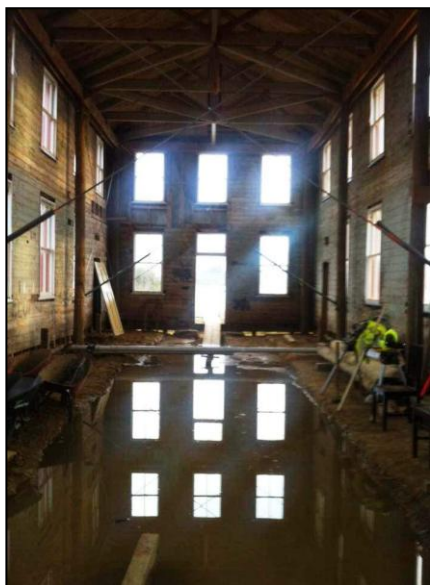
Flooded sub-floor space (MPQ) between 22nd May and 12th June 2015 (photo by Ana Terry).
